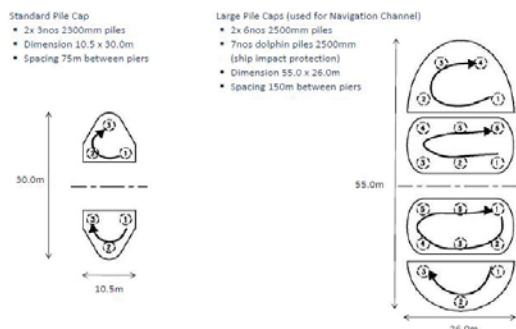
Pile Cap and Bored Piles for Standard Pier and Navigation Channel
